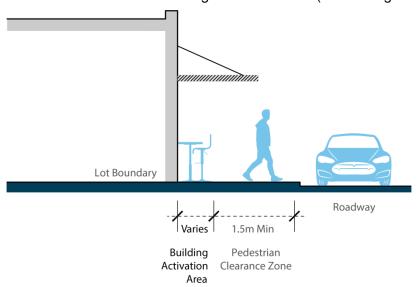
Building Activation Area - Footpaths Less Than 3.5 Metres Wide
